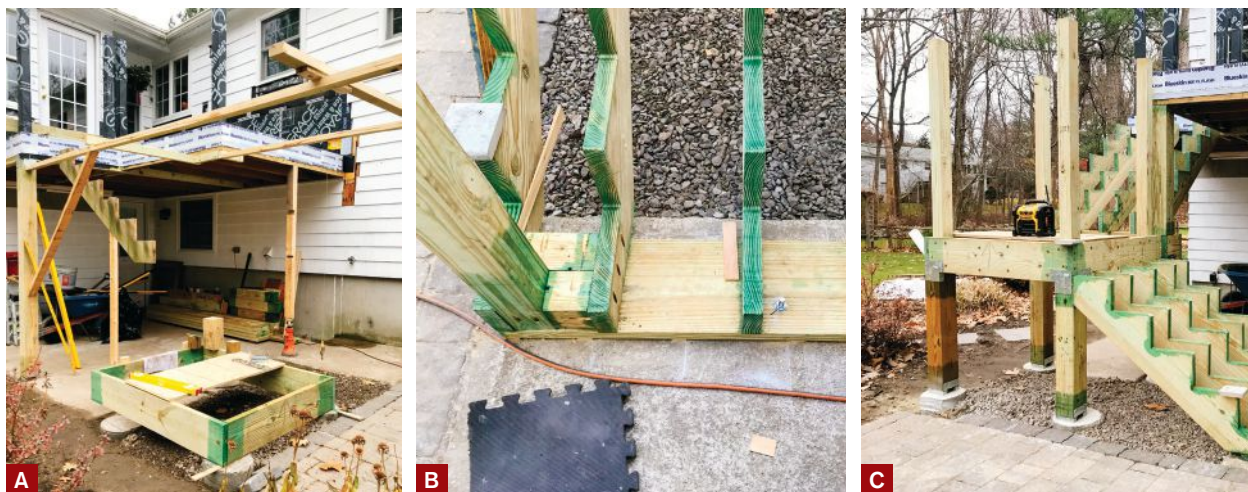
A temporary overhead frame defined the stair layout, ensuring that the new support posts and landing would be accurately located on top of the piers (A). The lower stair stringers are pocket-screwed to a 2x10 that's wedge-bolted to the concrete-slab landing (B). Here, the stairs have been re-framed and are ready for tread and riser installation (C).
